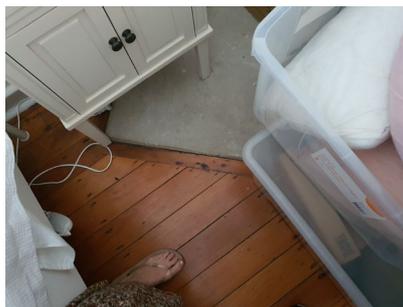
124: Concrete hearth providing evidence of location of original corner fireplace in master bedroom.
